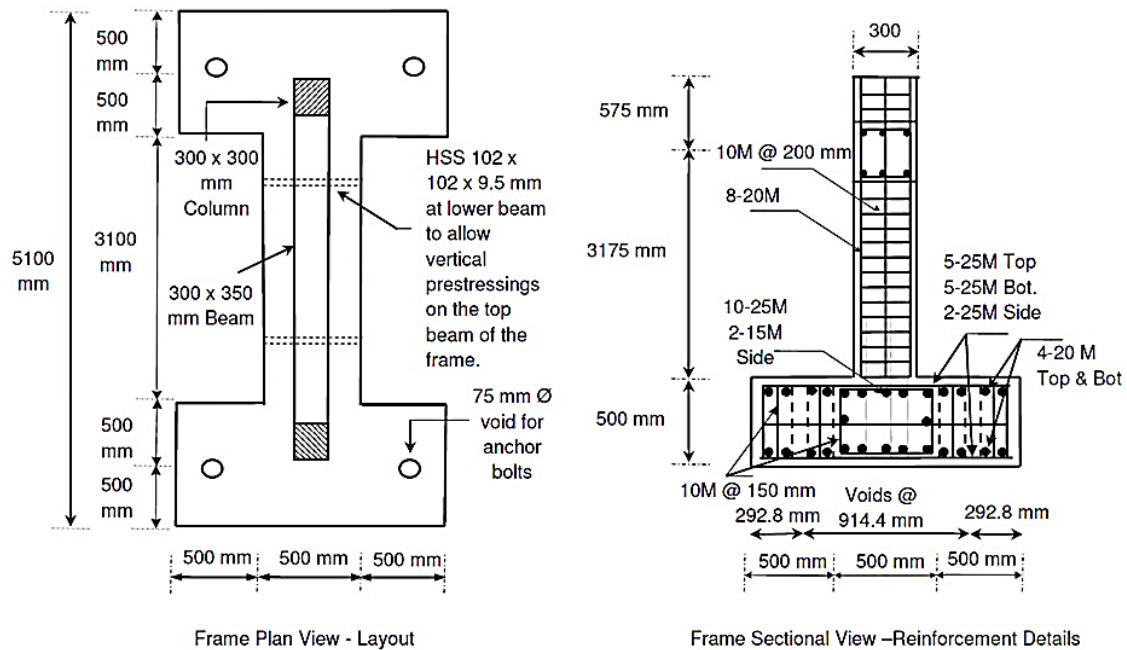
Frame plan and sectional views (Al-Sadoon, 2016)
